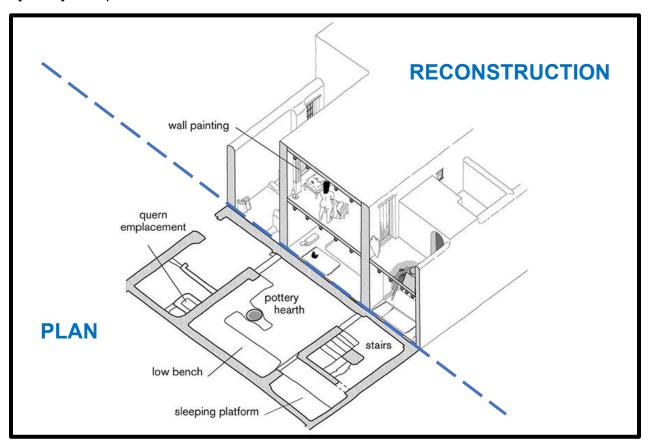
Plan and reconstruction of #8 Gate Street, a type A House
